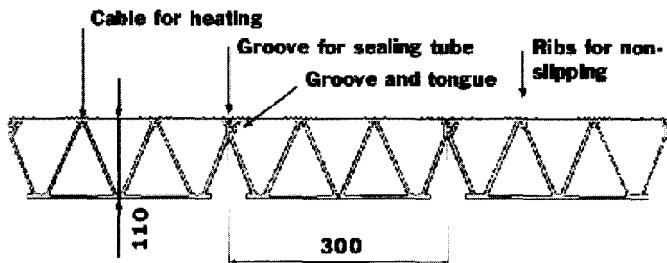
Extruded Aluminum Profiles Used for a Deck
